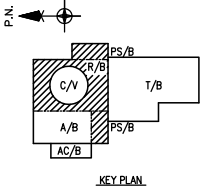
US-APWR Building Configuration (Plan View)
